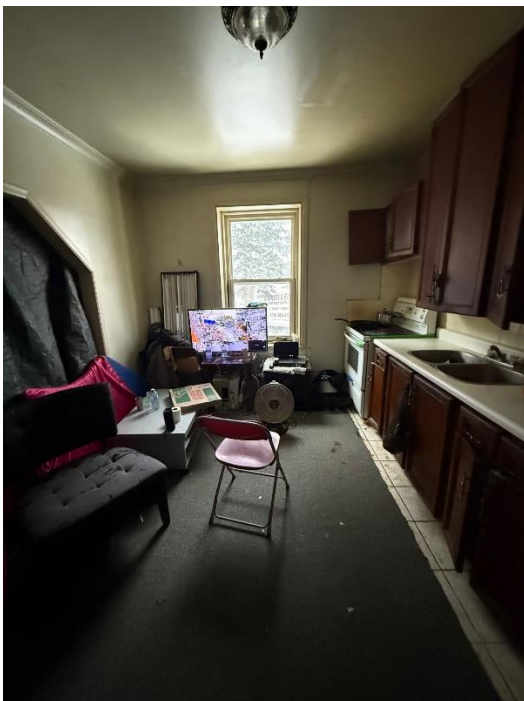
The existing kitchen has altered flooring and is in overall poor condition.
